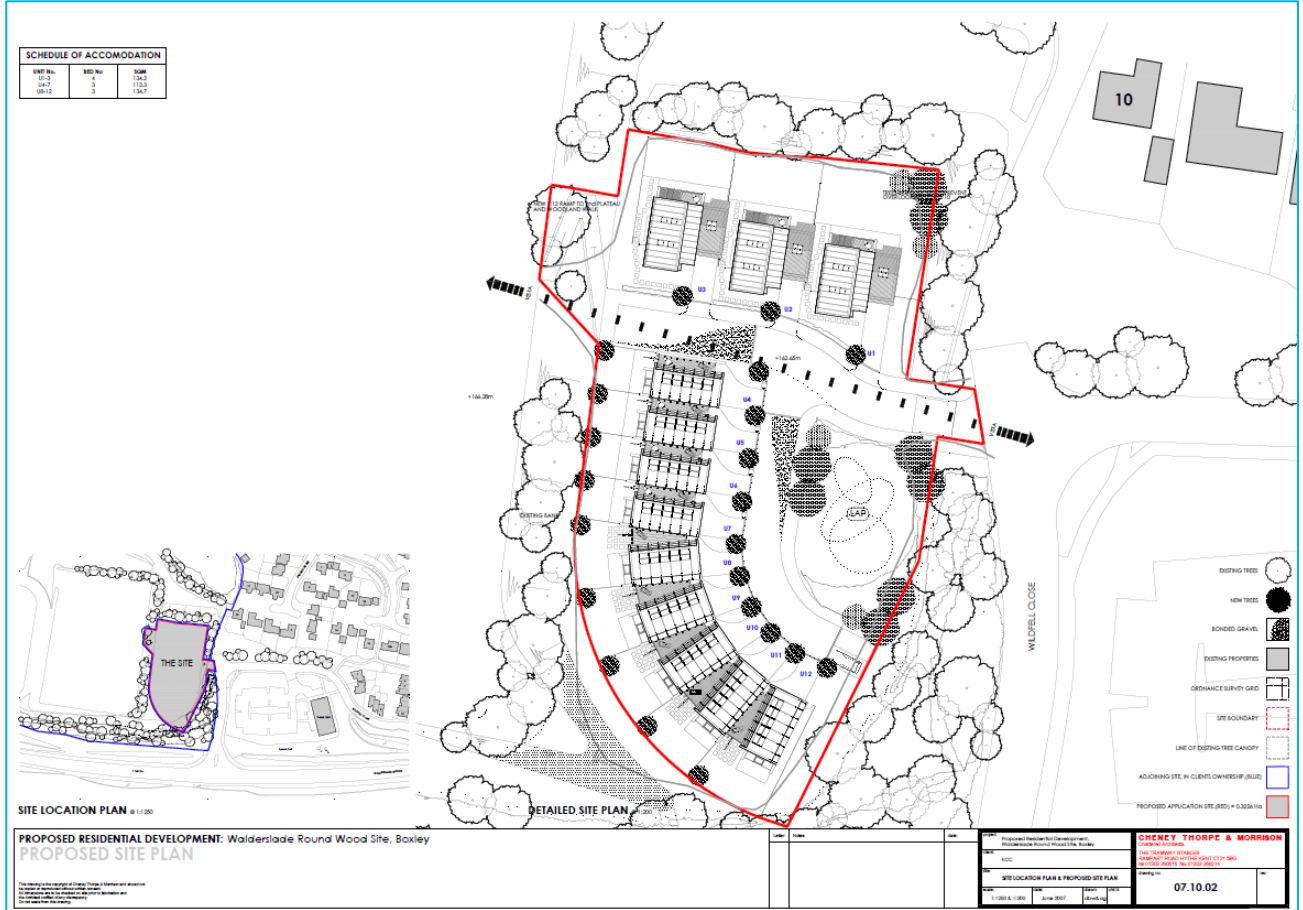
Site location and proposed site plan (Drawing Cheney Thorpe & Morrison Site Location Plan & Proposed Site Plan 07.10.02' dated June 2007).
